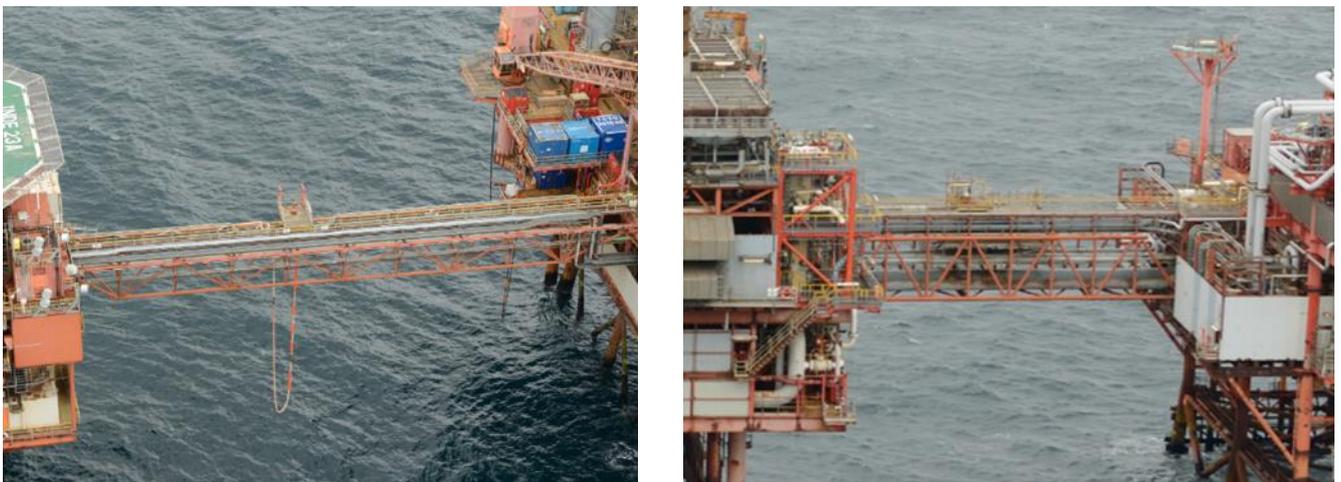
Photographs of Inde 23A bridges. Left – AQ-AC Bridge. Right – AT-AC Bridge.
